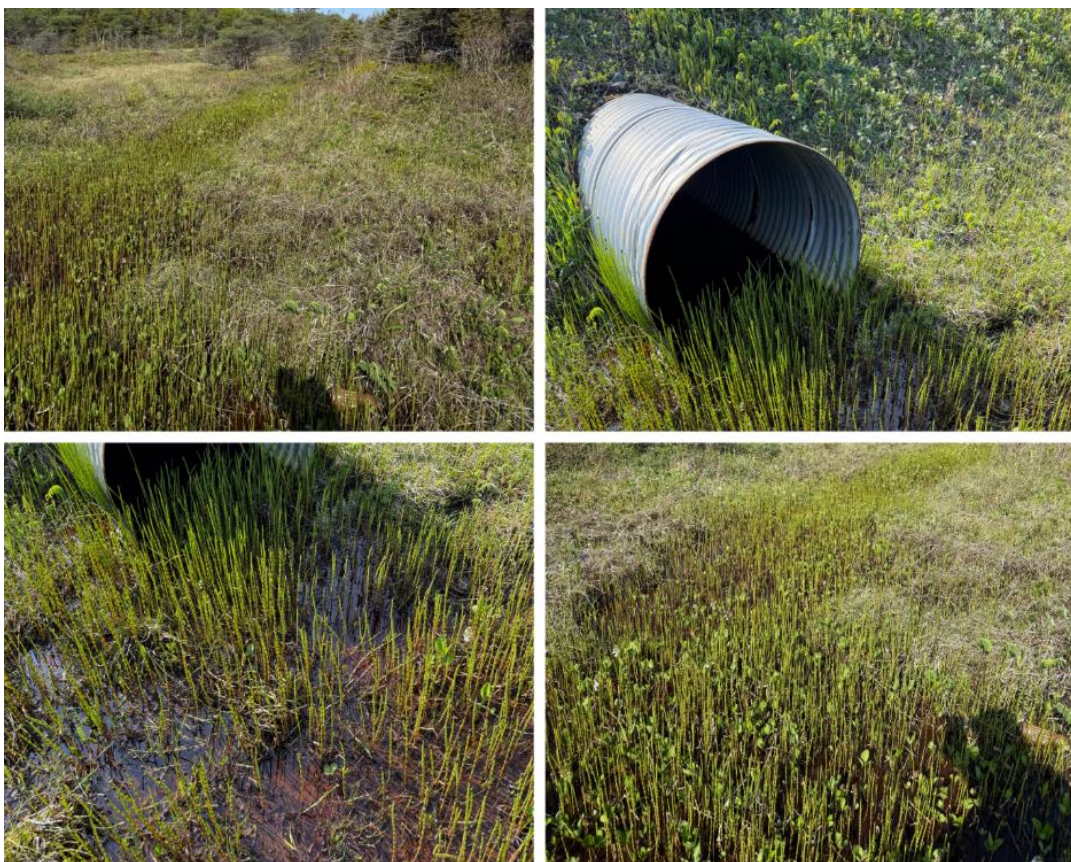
Water Crossing No. 9 (WC9; 50.214896°N, 57.602215°W; elevation 13.0 m) is an ephemeral channel <1.0 m wide
